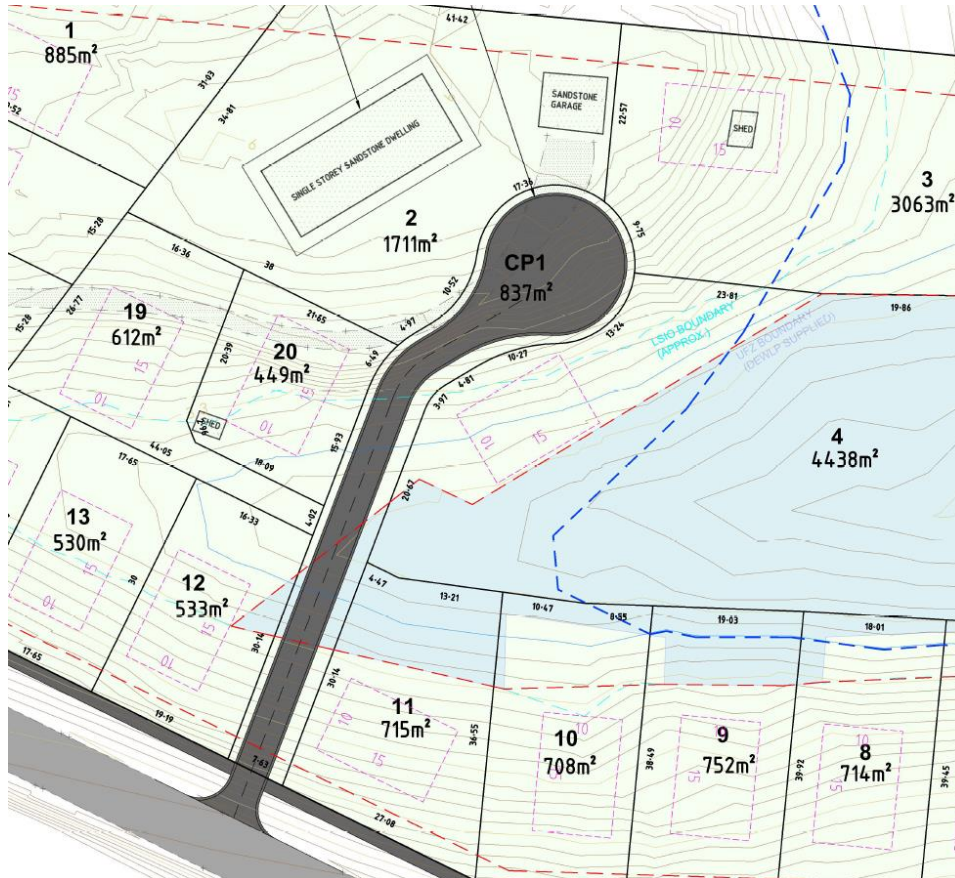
PROPOSED COMMON PROPERTY ROAD LAYOUT
